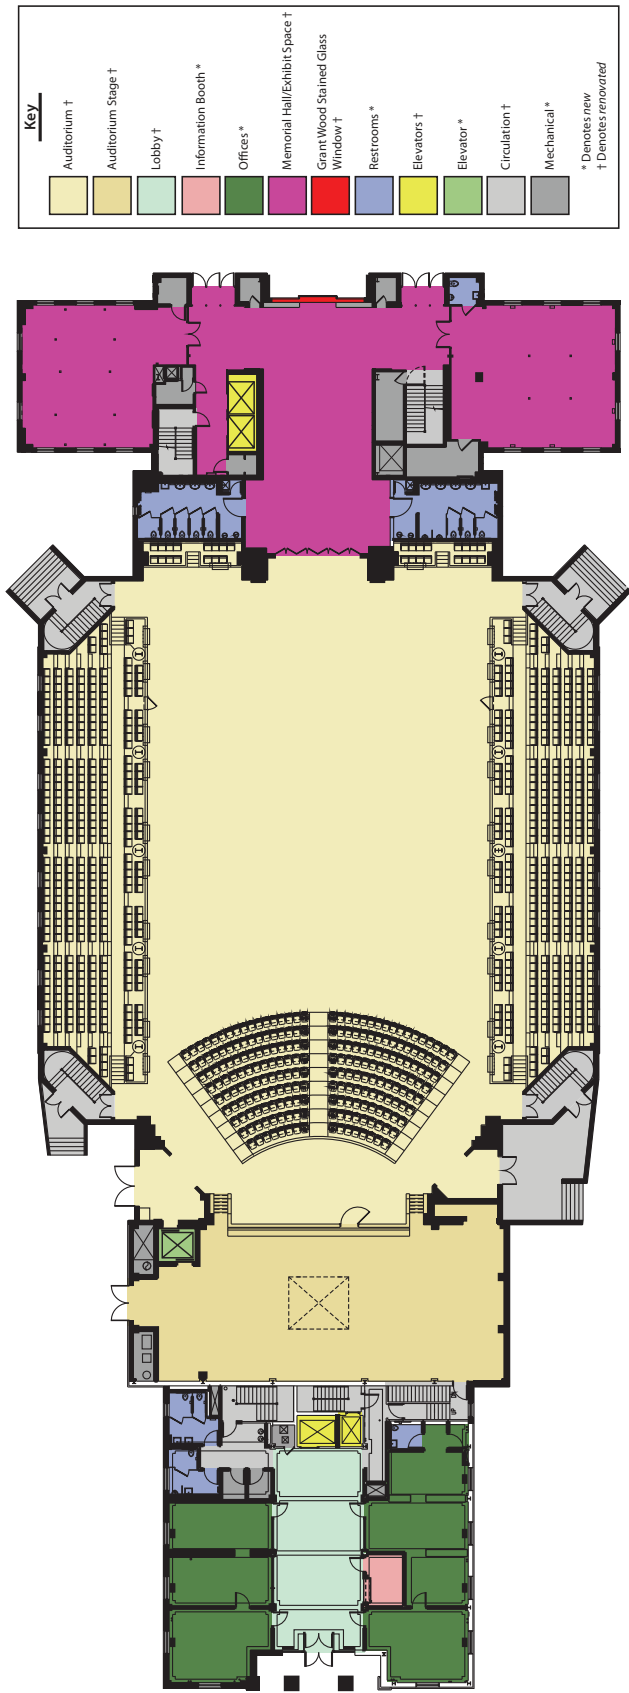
Veterans Memorial Building first floor plan - after renovation, Cedar Rapids, Iowa.
